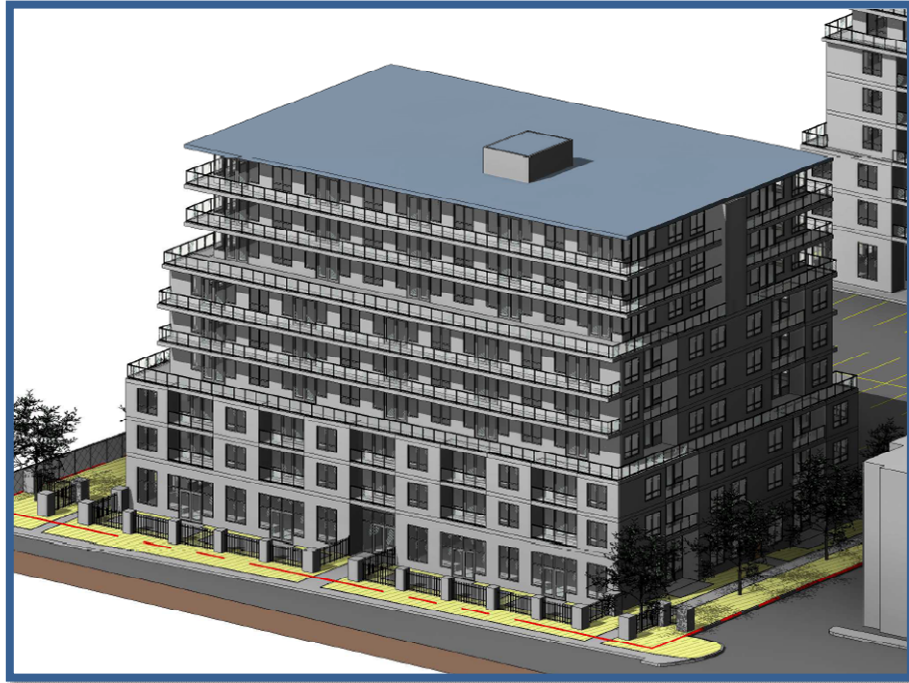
3D rendering of the proposed building fronting Lundy’s Lane
